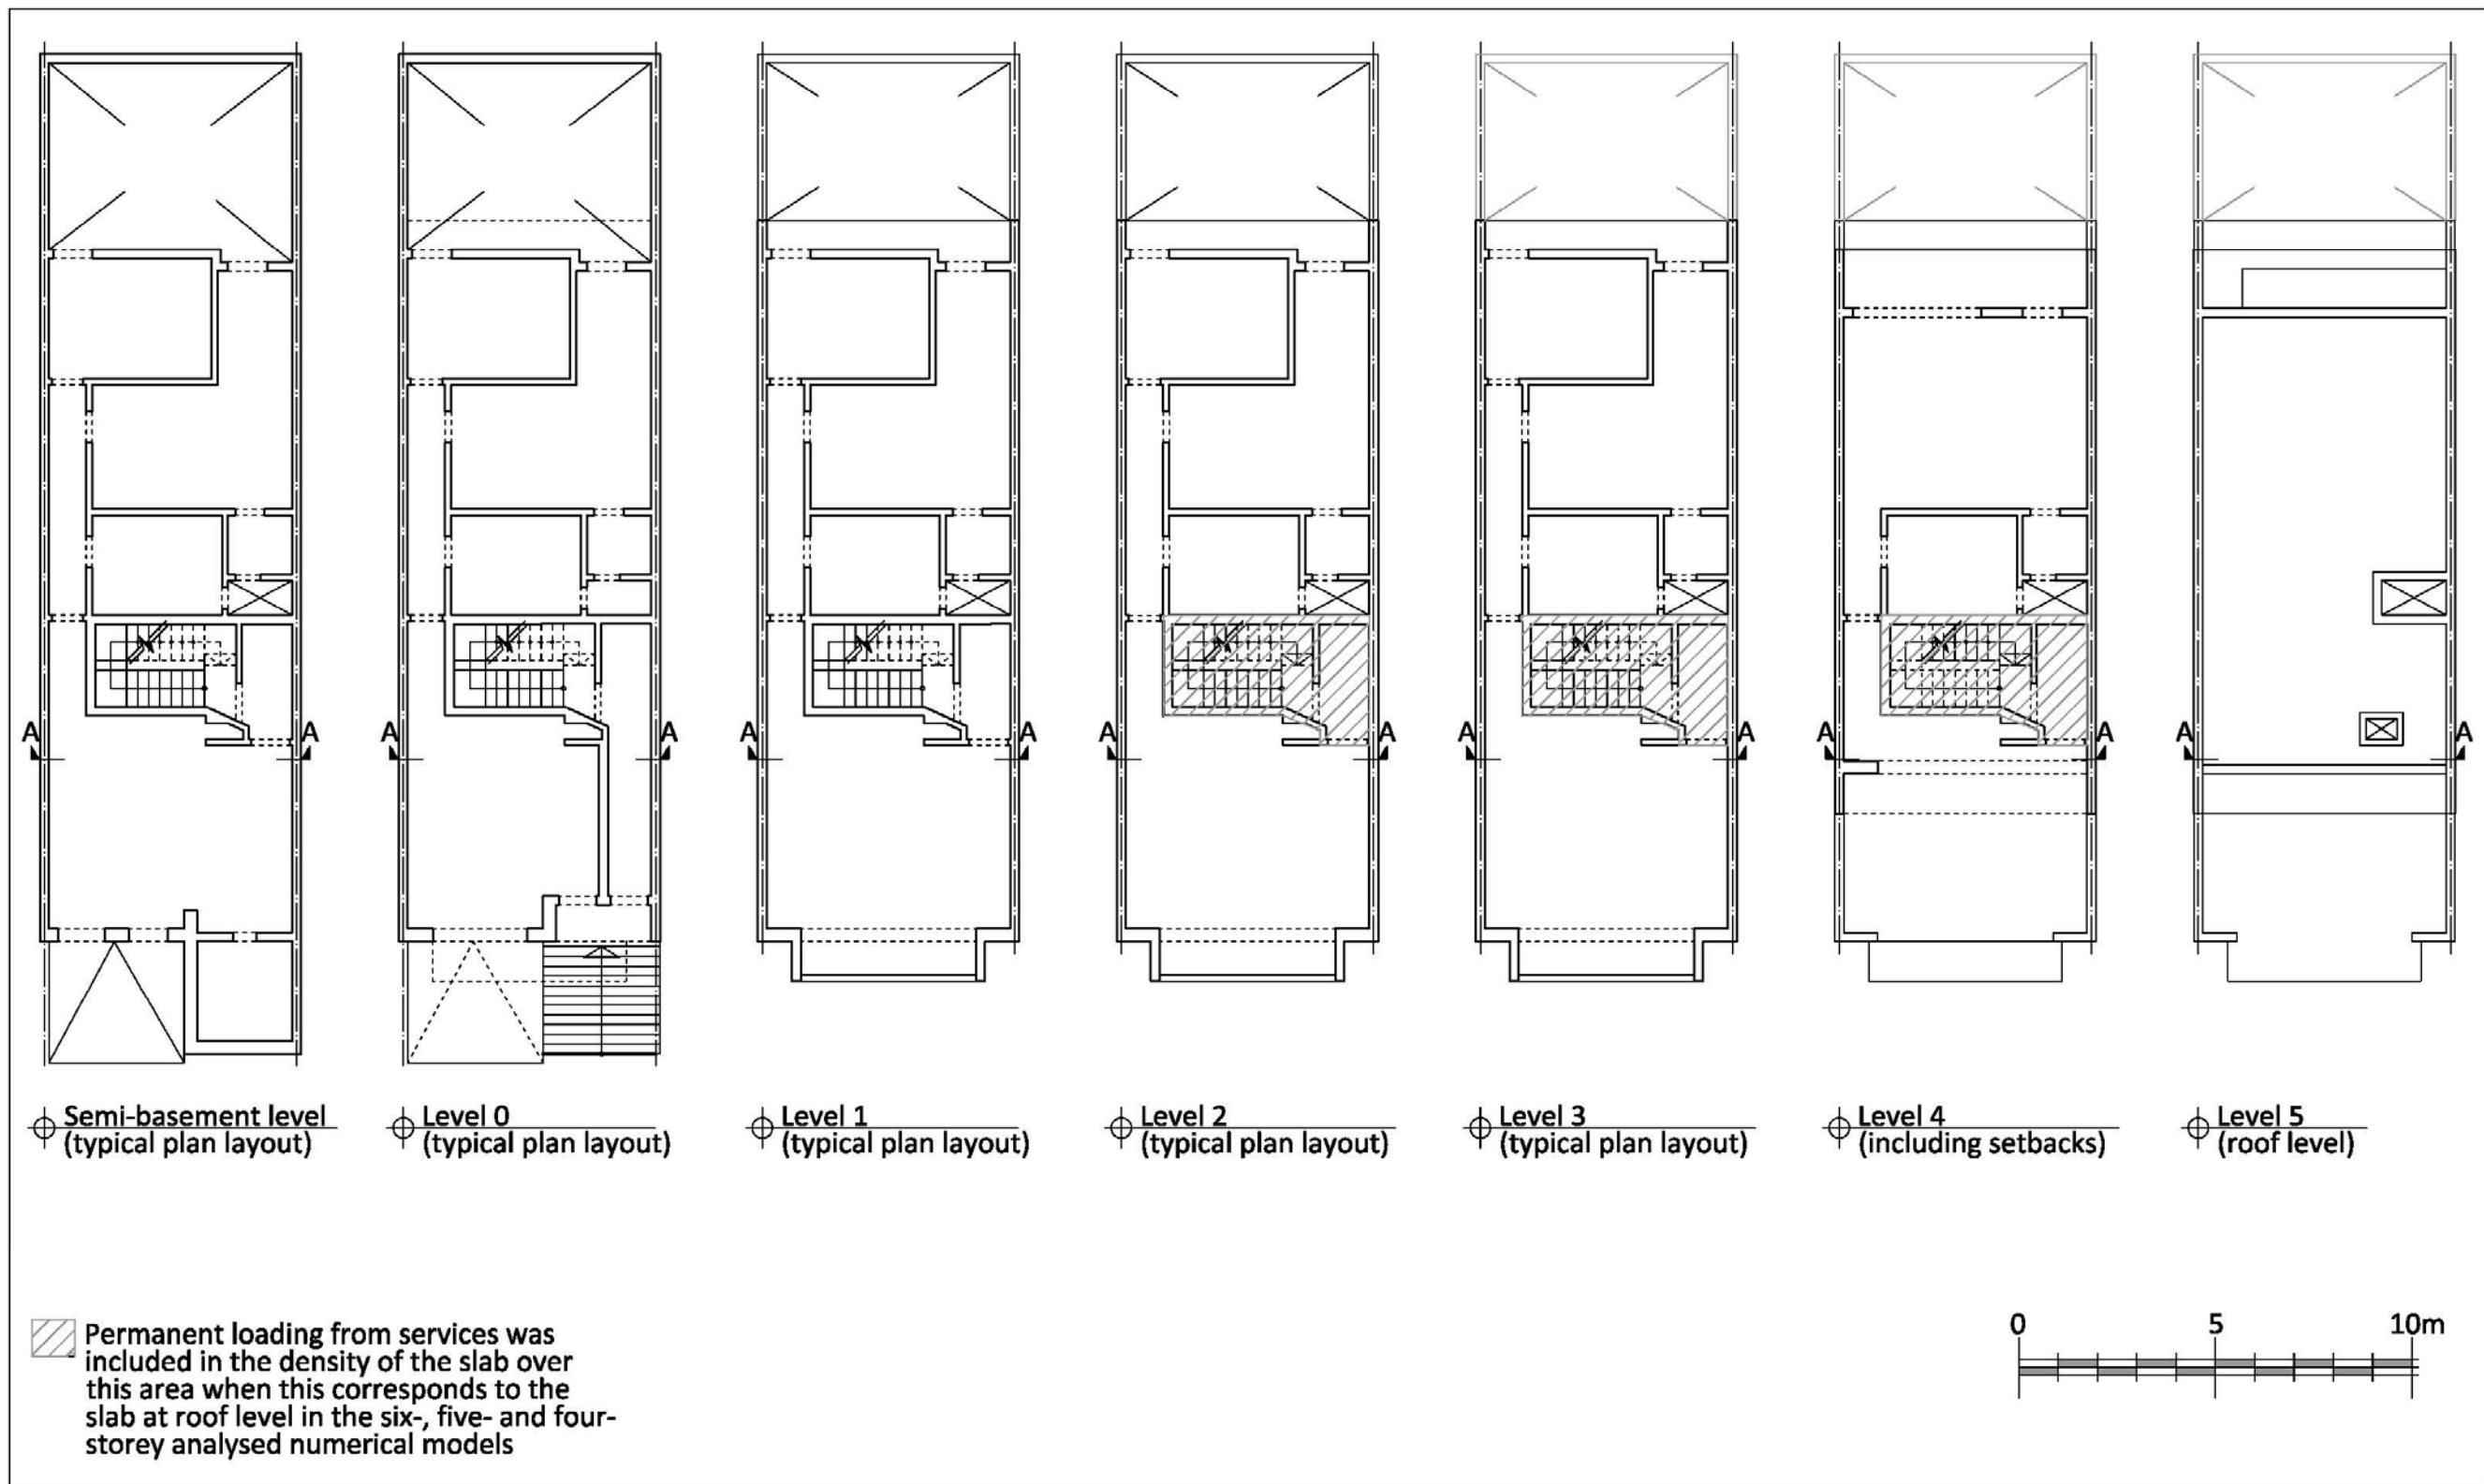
Plan layouts at all levels for analysed single building numerical models including setbacks at penthouse level (plan length-to-width ratio 2.75:1).
